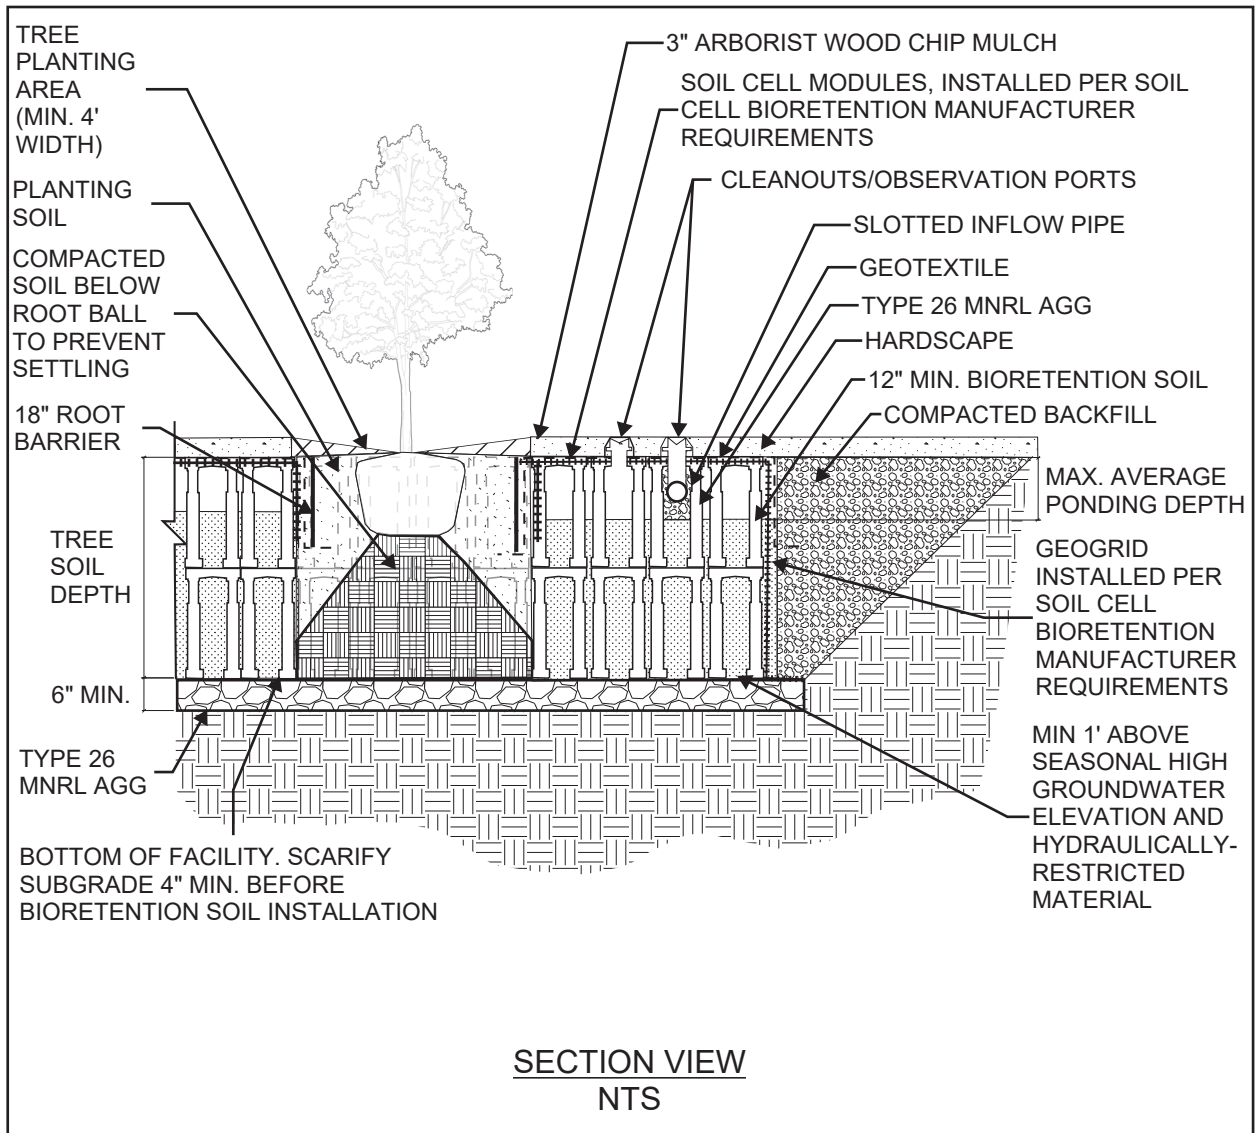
Example Infiltrating Soil Cell Bioretention (without Underdrain) Profile.
